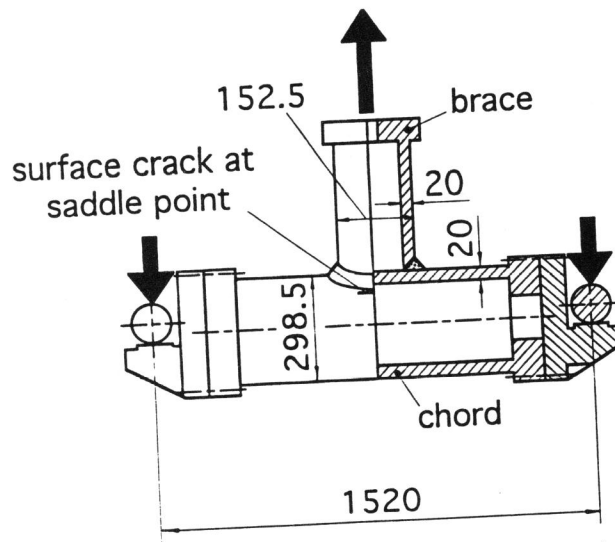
Geometry and dimensions of the tubular joint model specimens, dimensions in mm
